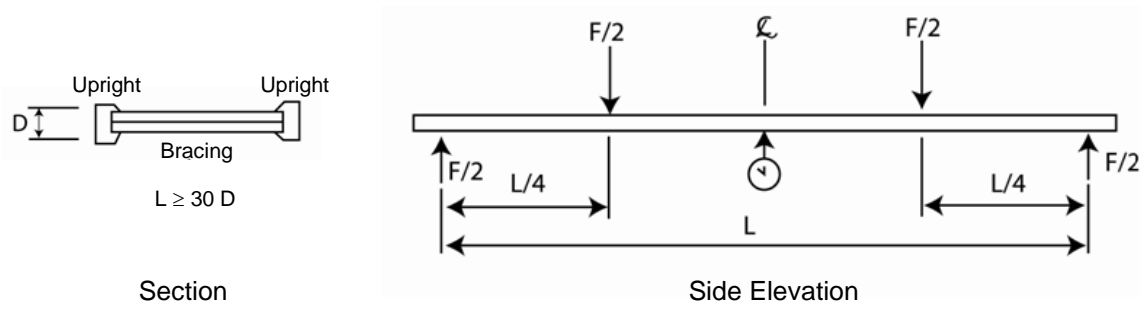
Test arrangement for the major axis bending test on upright sections [10]
